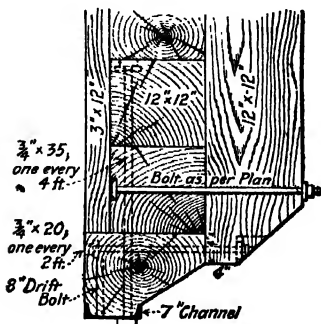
Section of Cutting Edge, Broadway Bridge.
